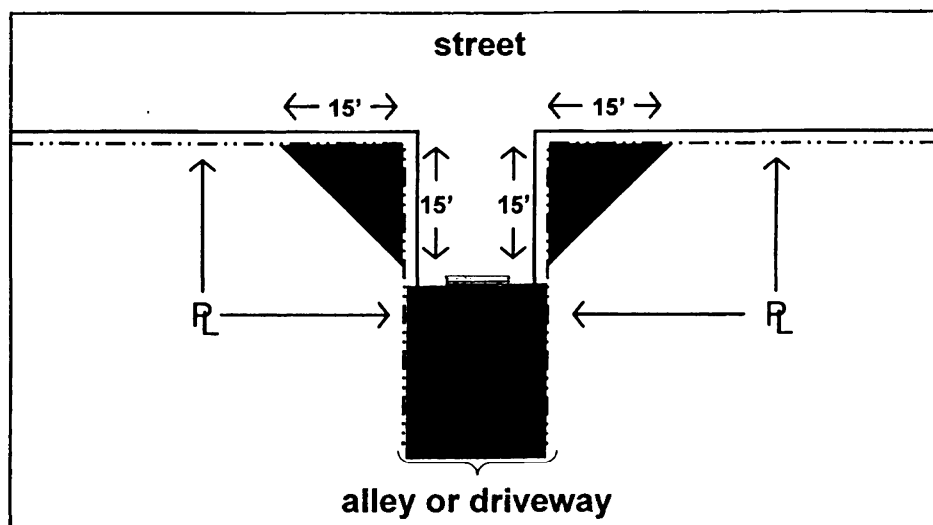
Sight Triangle at the Intersection of a Driveway or Alley and a Street
